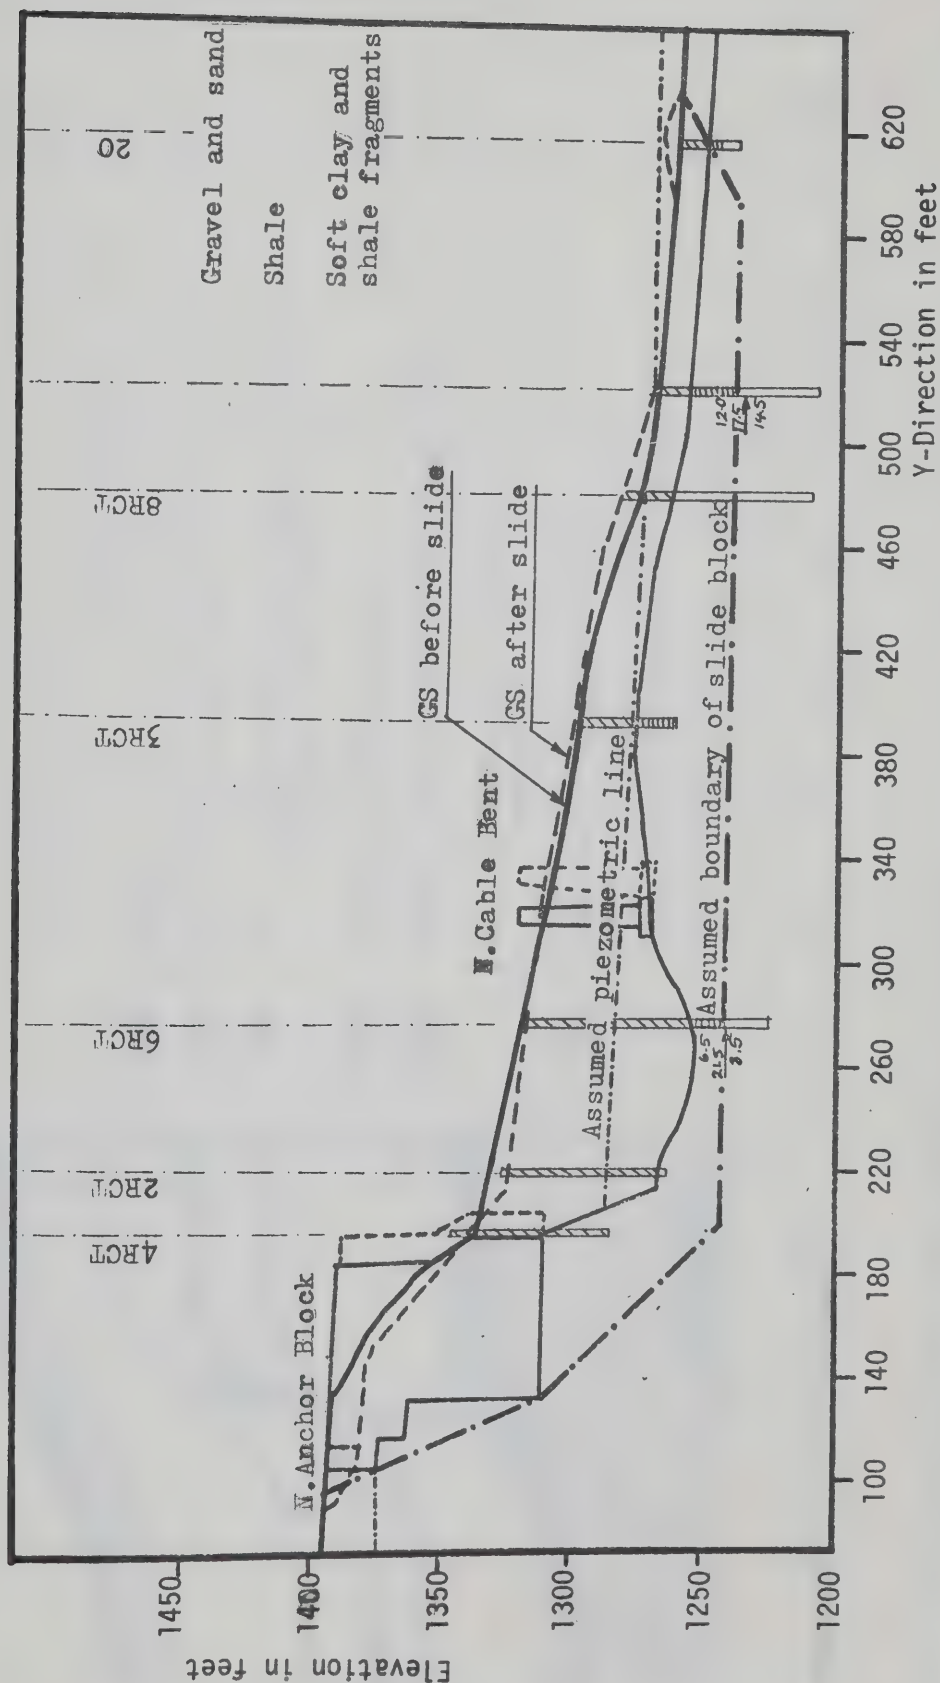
FAILURE OF PEACE RIVER BRIDGE AT TAYLOR, B.C.:
